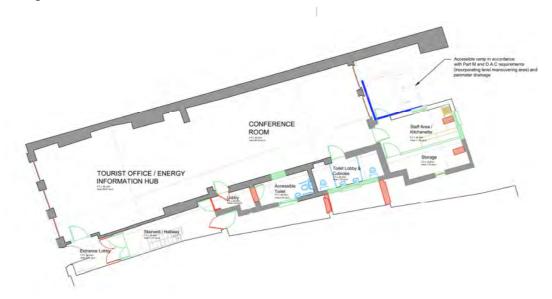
LCC 001 Proposed GF Plan - Level 00
